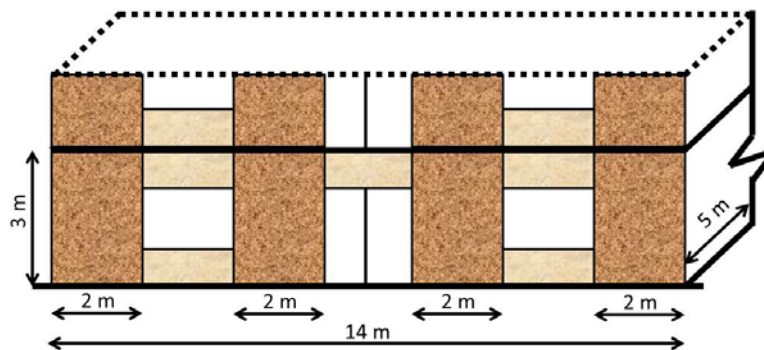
Panel configuration and basic dimensions of the external side of one typical story level of the building
